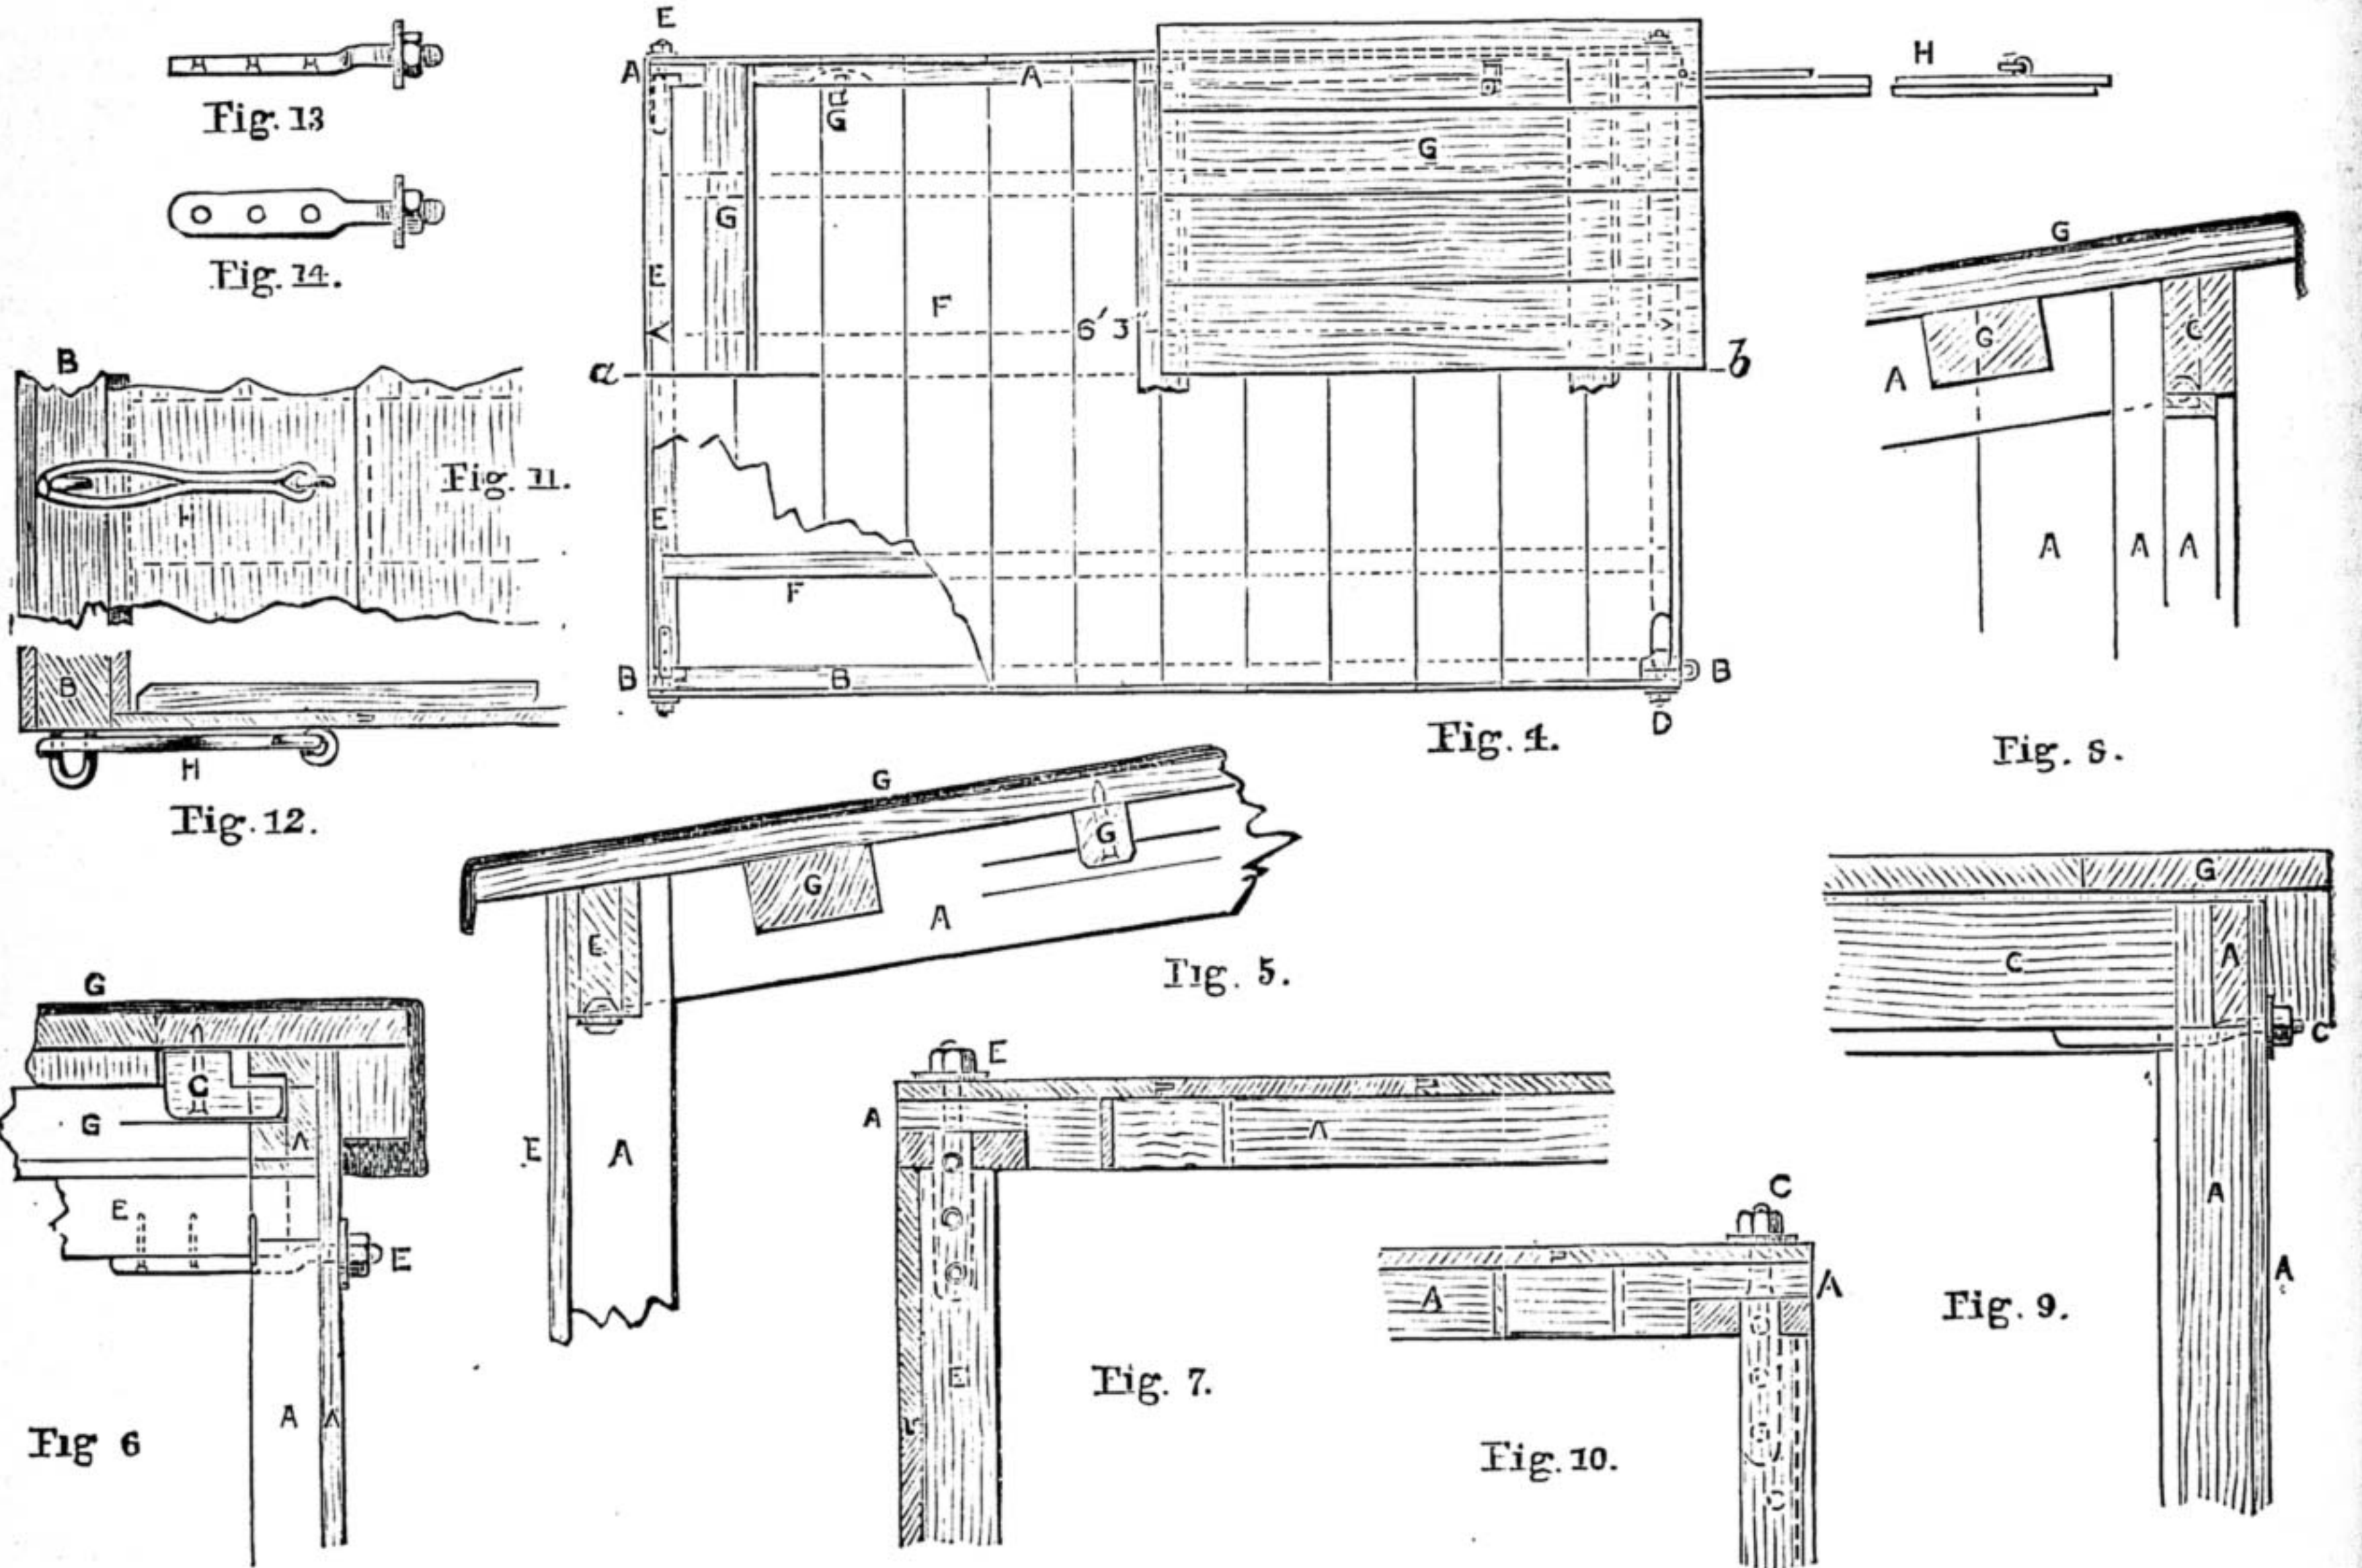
Plan of House, showing Roof Boards removed in Upper Left-hand Corner; Felt removed in Upper Right-hand Corner; Section on Vertical Side Post in Lower Right-hand Corner; Floor Boards broken to show Scantlings to carry them in Lower Left-hand Corner. (Scale, $\frac{1}{2}$ in. to 1 ft.) Figs. 5, 6, 7.—Longitudinal Transverse Sections and Plan respectively of Top Right-hand Corner of Back of House. N.B.—Lower Joints at Back are similar, except that Longitudinal Side Stay is square, not sloping. Figs. 8, 9, 10.—Longitudinal Transverse Sections and Plan respectively of Top Right-hand Corner of Front of House. N.B.—Lower Joints are similar, except that Longitudinal Side Stay is square, not sloping. Figs. 11, 12.—Elevation and Plan of Door, showing Fastening Arrangement. Figs. 13, 14.—Bolts for holding Shed together. (Scale of Figs. 5 to 14 inclusive, $1\frac{1}{2}$ in. to 1 ft.)
